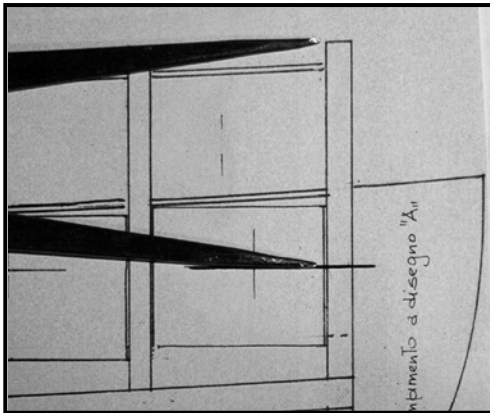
Using Calipers to Check Dimensions from Plan Sheet
